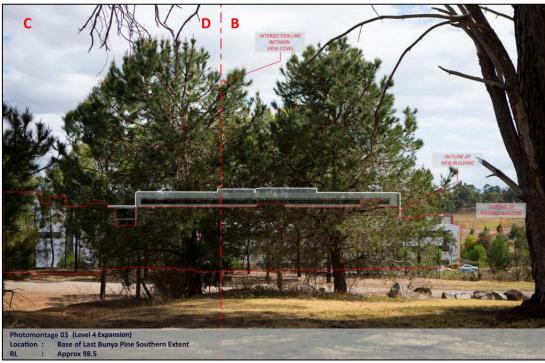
On-site vegetation obscures views to and beyond Norwest Private Hospital
